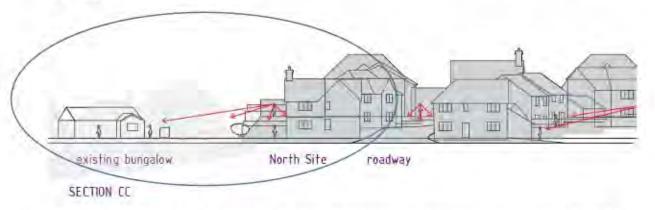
North Site Section CC, showing the effect on existing houses and overlooking from the upper terraces.
